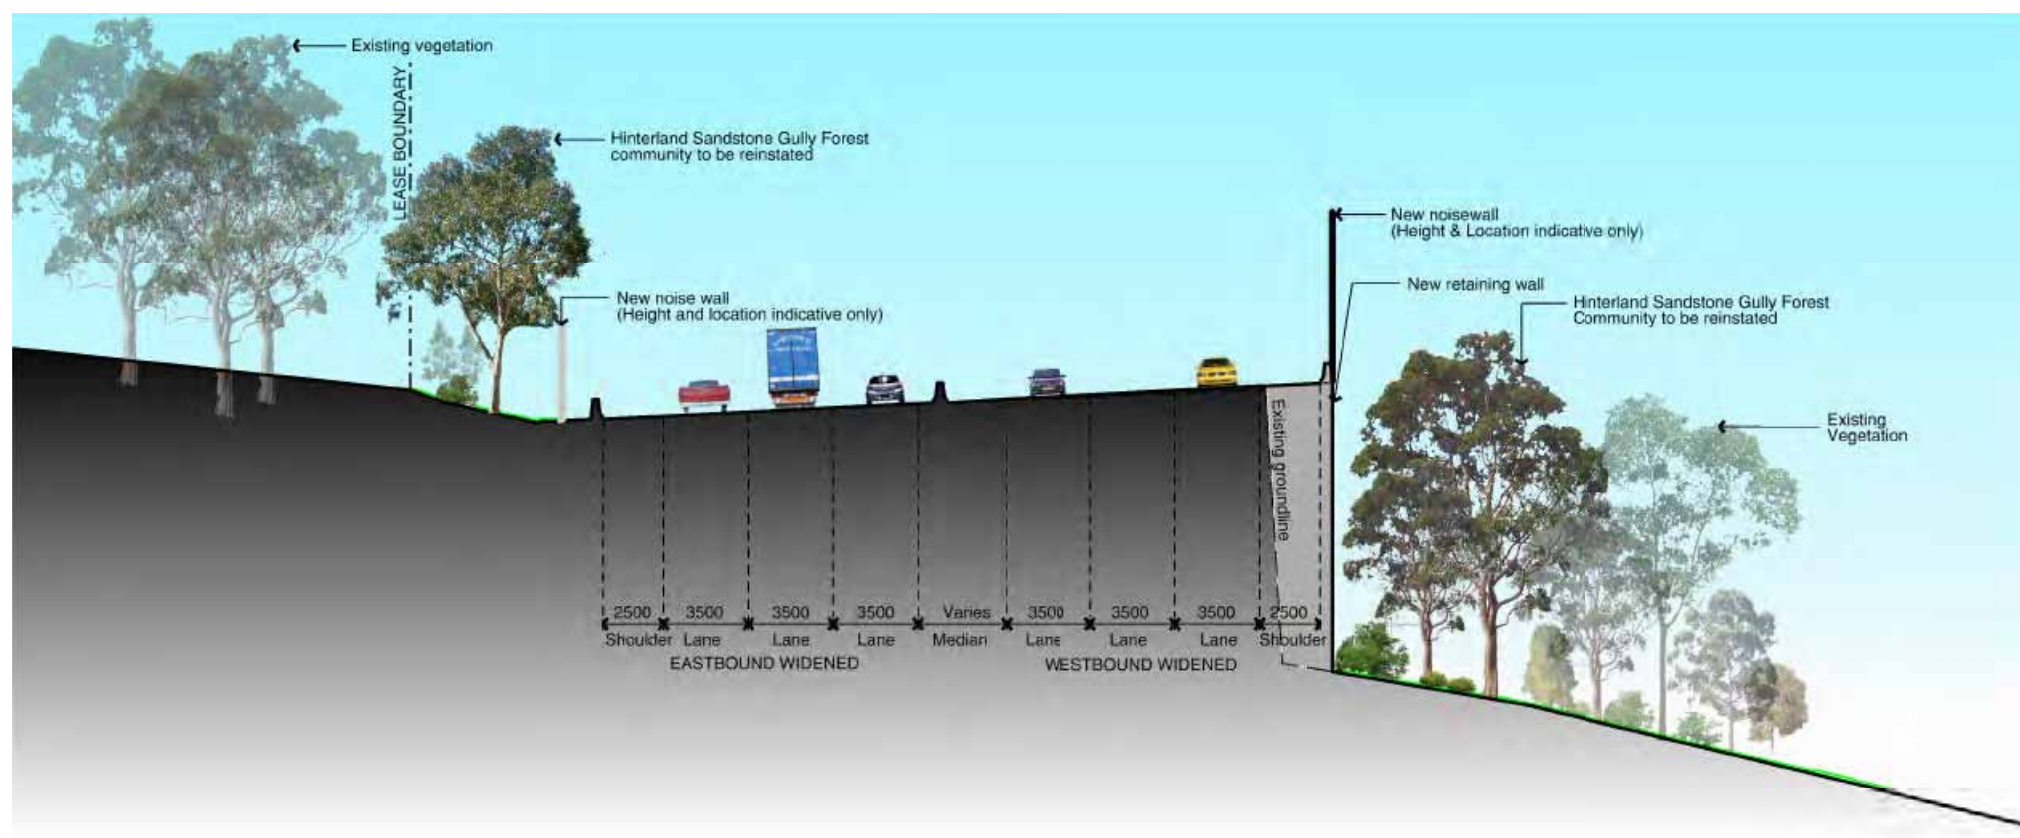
Stn 13600 Somerset Street east - Proposed
